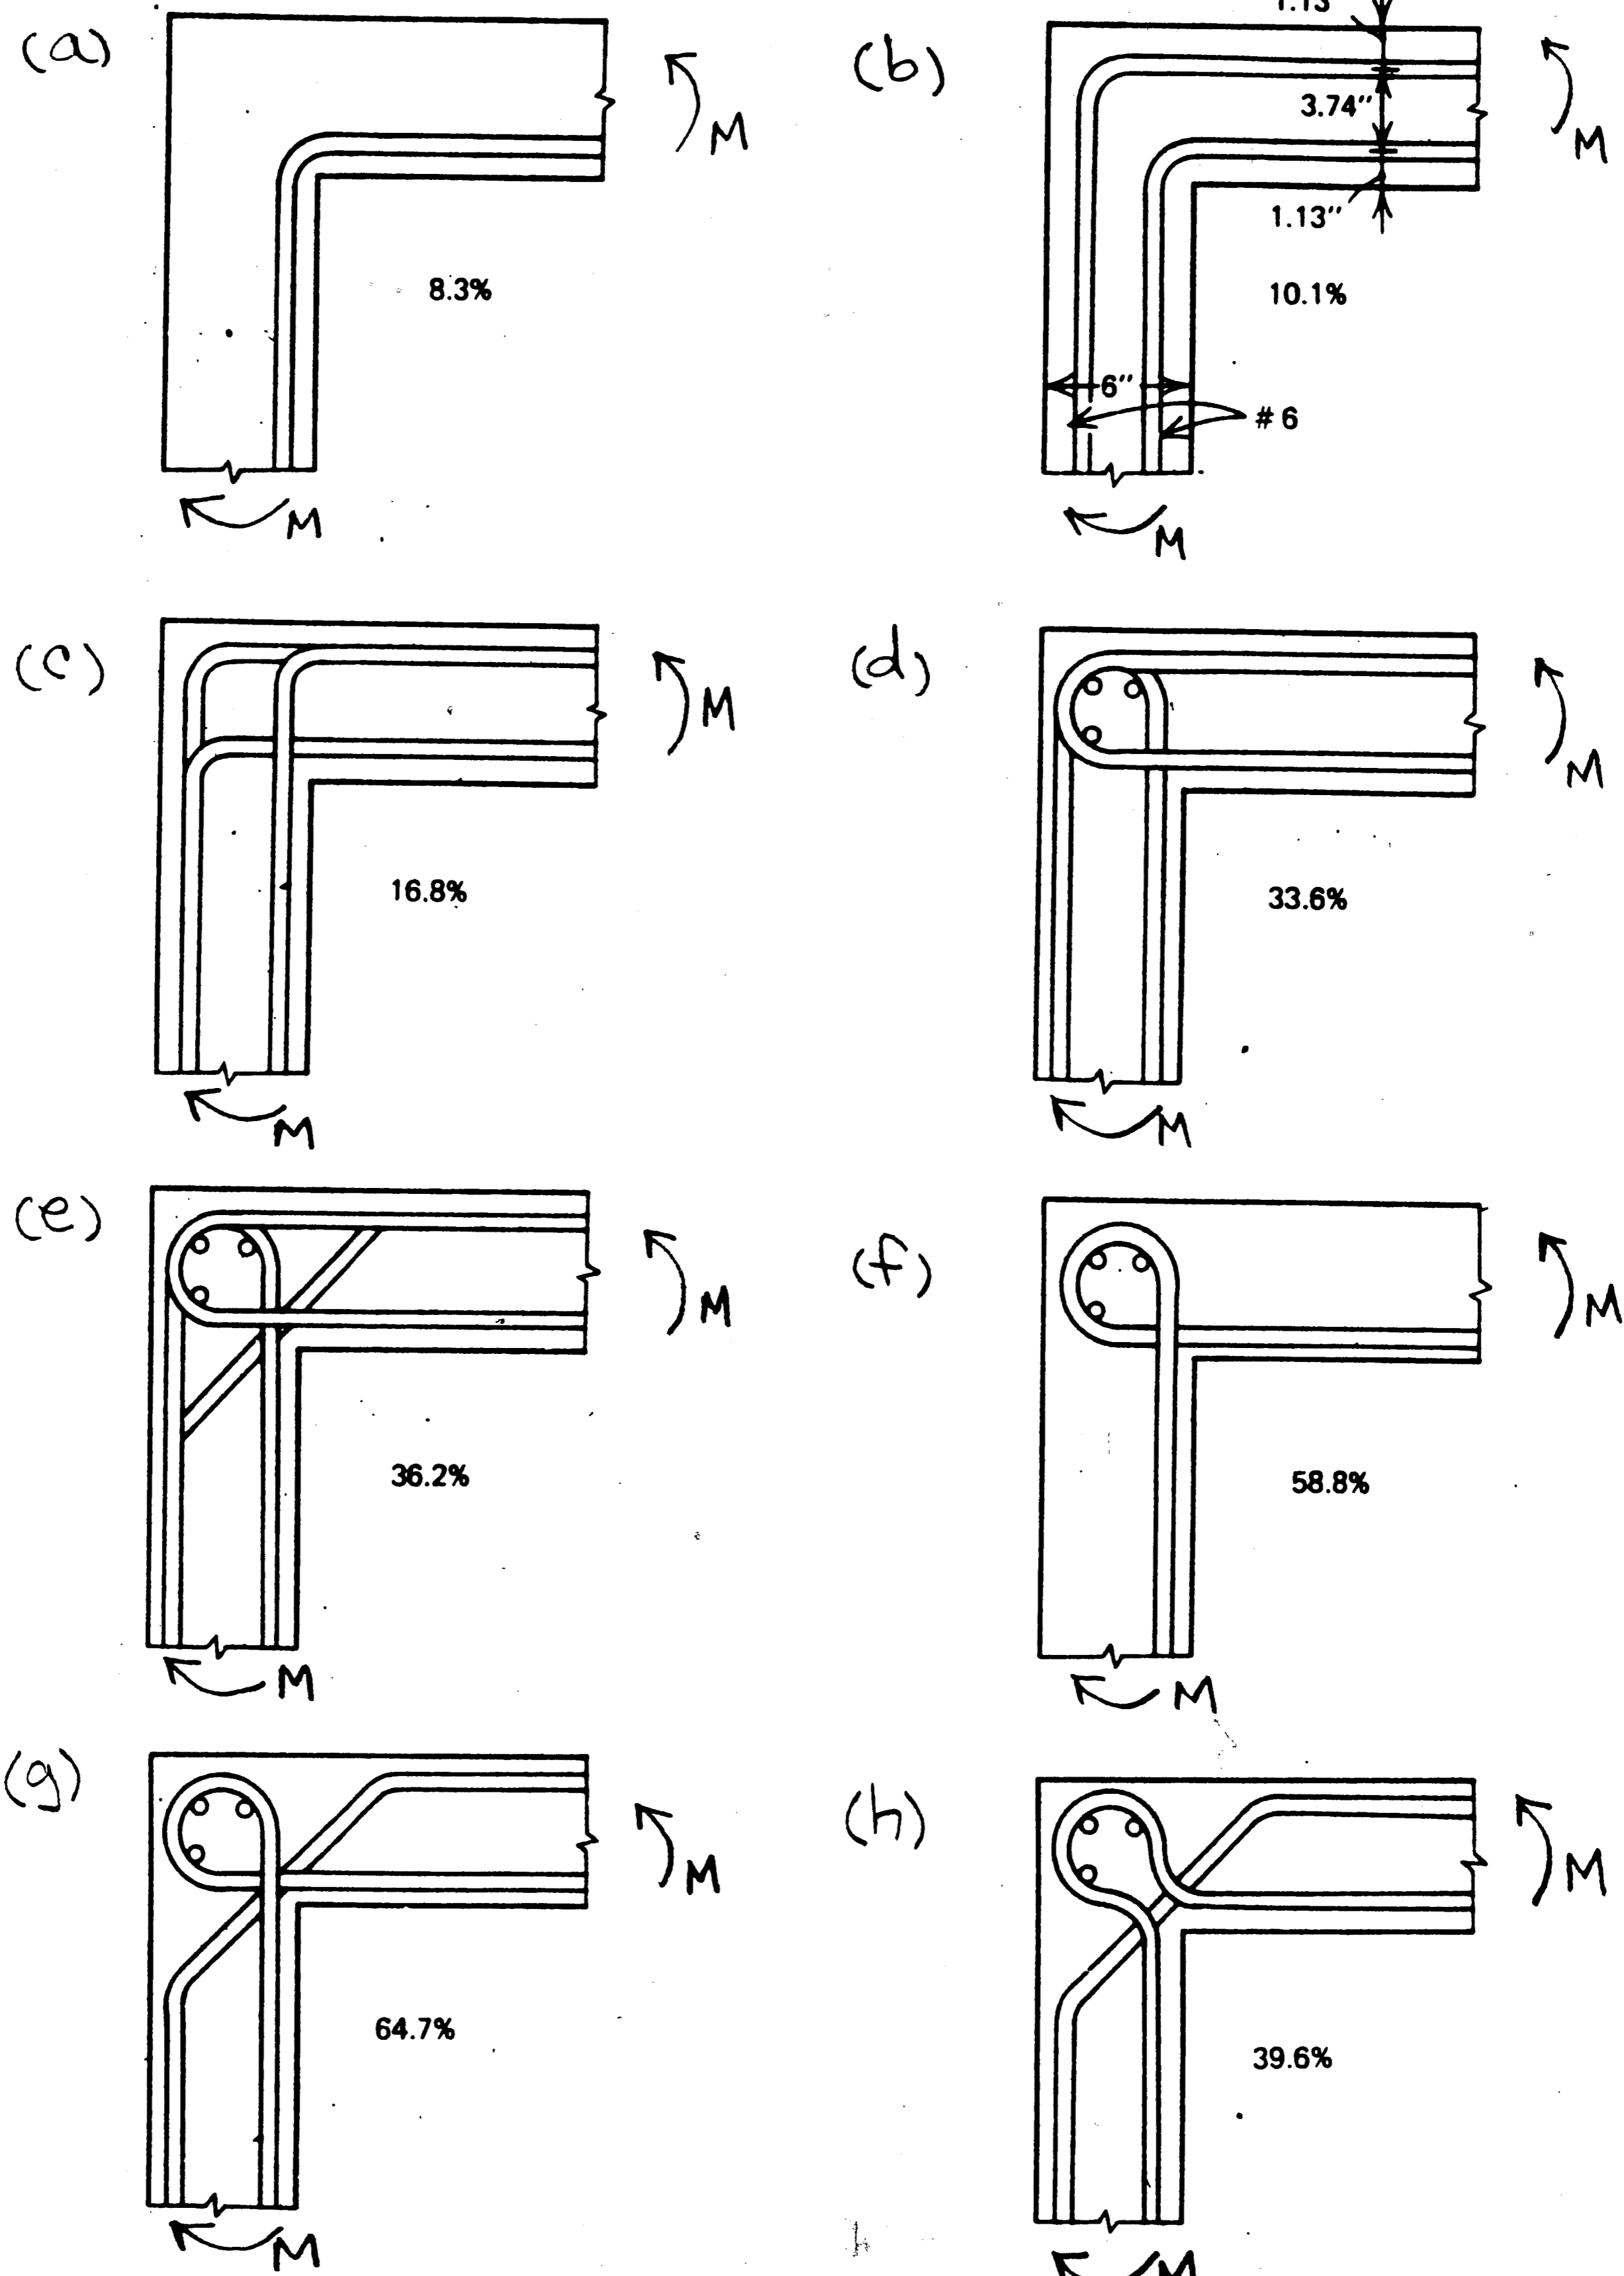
Opening knee joint details of small dimensions (ref. 24)
